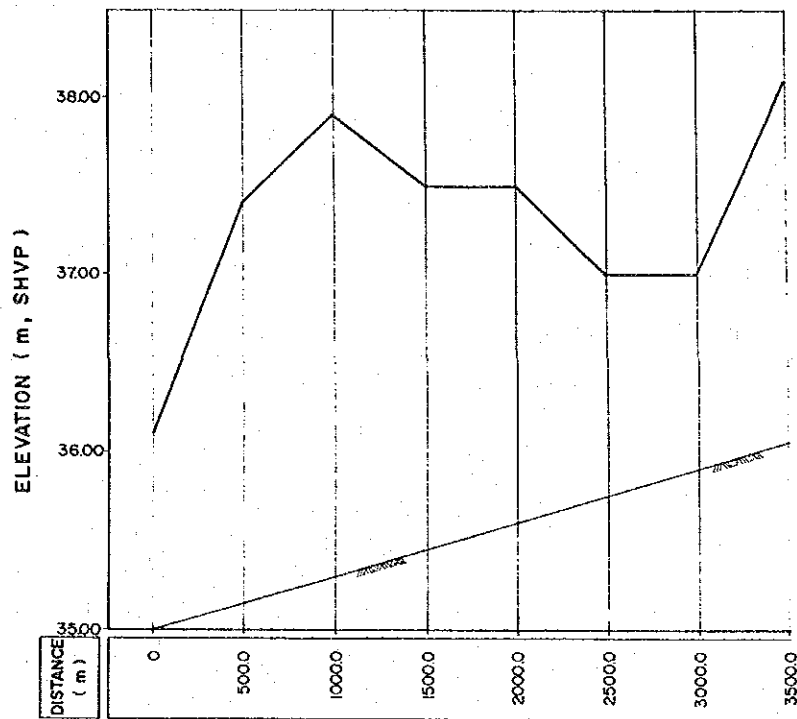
LONGITUDINAL PROFILE AND STANDARD CROSS - SECTION OF DRAINAGE CANAL FROM SIDE OVERFLOW DIKE TO DRAINAGE SLUICE OF RIGHT WIDAS RETARDING BASIN ( 2/3 )
